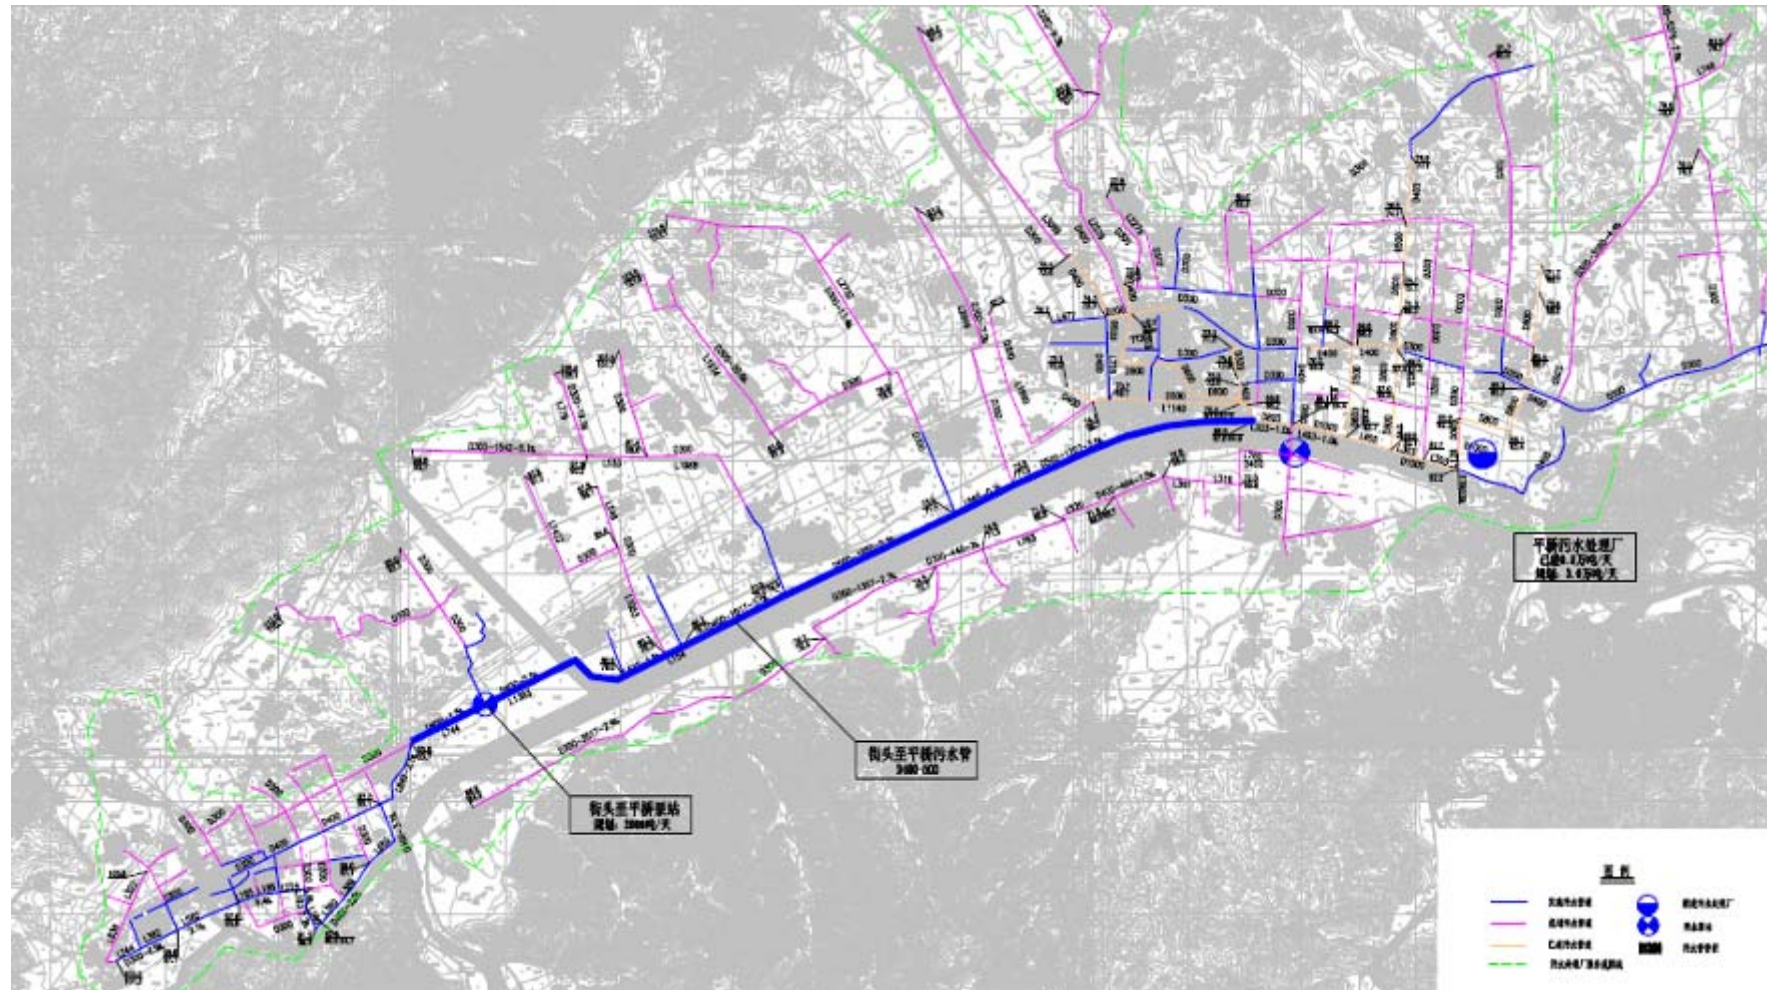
Sewage Piping Routing Drawing in West District of Tiantai Basin
